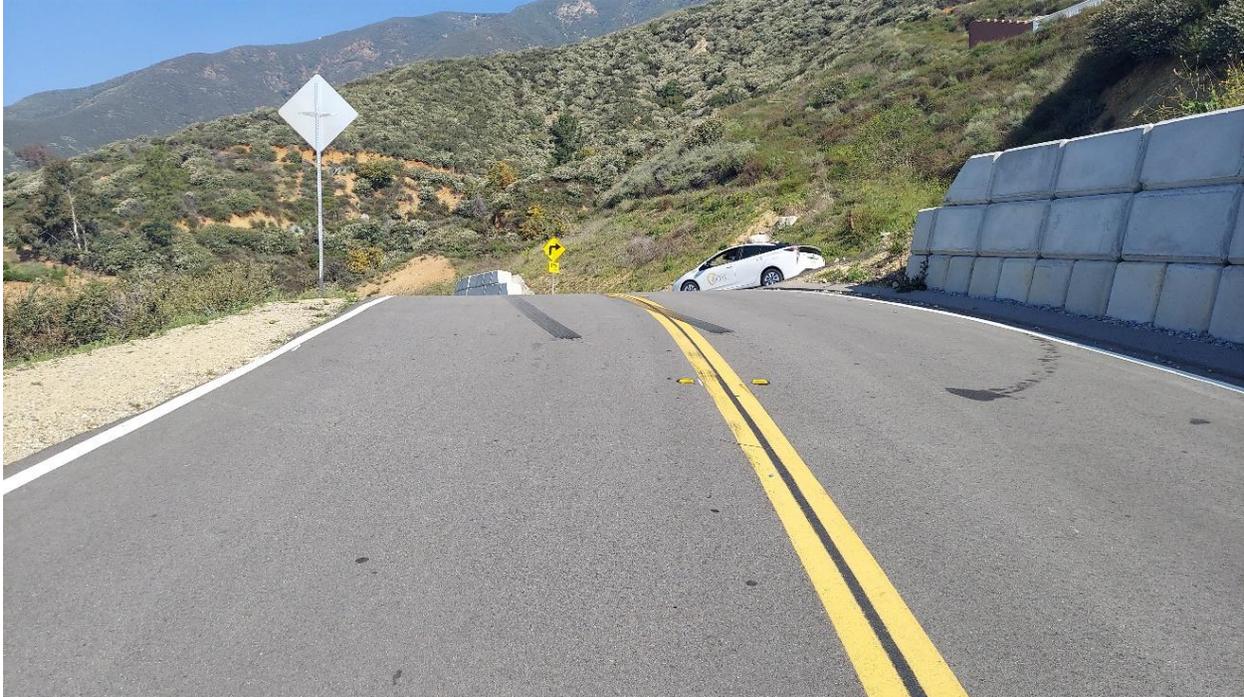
Snowdrop Road looking west from 9922 Santina Street driveway (Santina Street). Vertical curve limiting sight distance and skid marks are noted.
